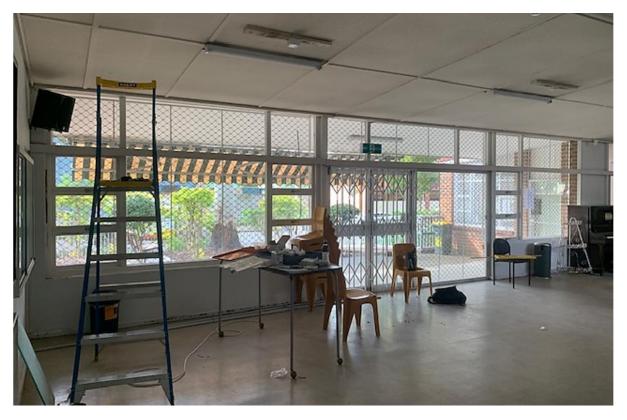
View through north facade from main hall to outdoor seating area and Ivy Street
